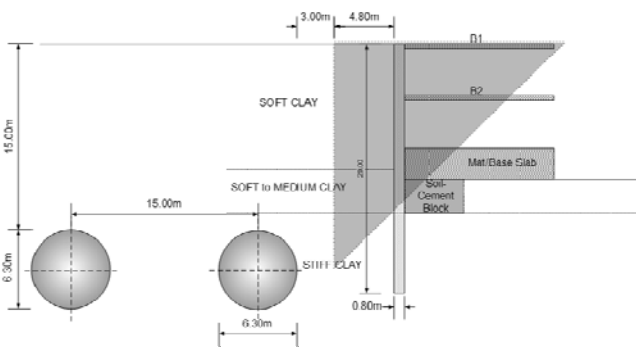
Typical section of diaphragm wall support deep excavation adjacent to MRT tunnel showing protection zone (Thasnanipan et al., 2006)
